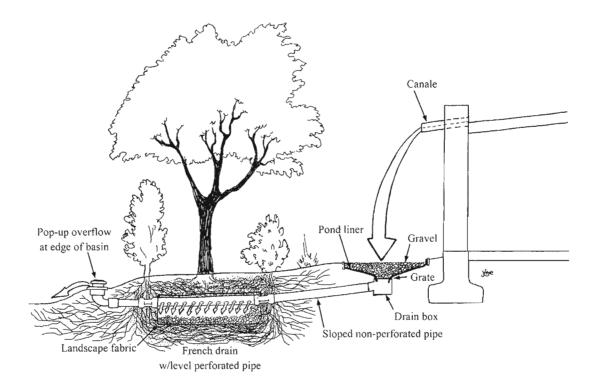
A canale roof drain, drain box, and pipe directing roof runoff away from the house to a French drain within the landscape. Note: While the illustration's perspective may be misleading, the vegetation is planted adjacent to the French drain, not on top of it. See fig. 4.10 for the option of using infiltration chambers instead of perforated pipe and gravel.
